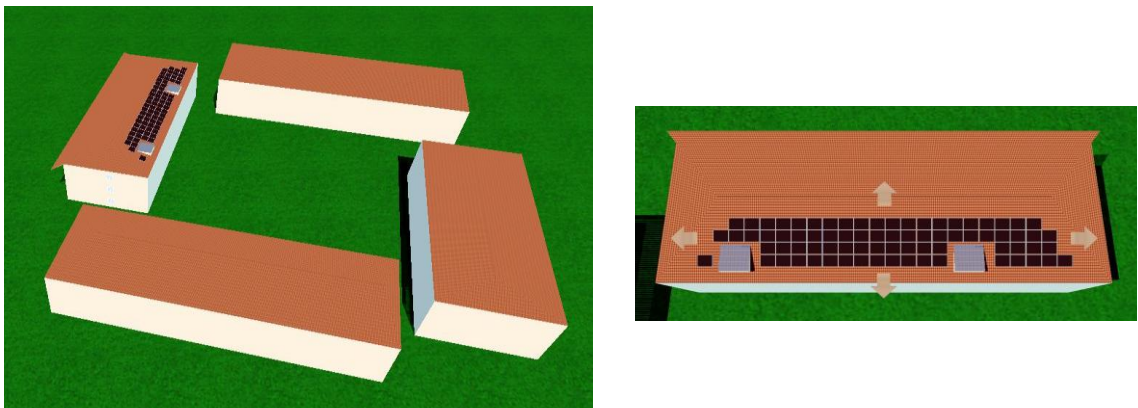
Situation plane over the four buildings group and the solar cell panel layout on House P
